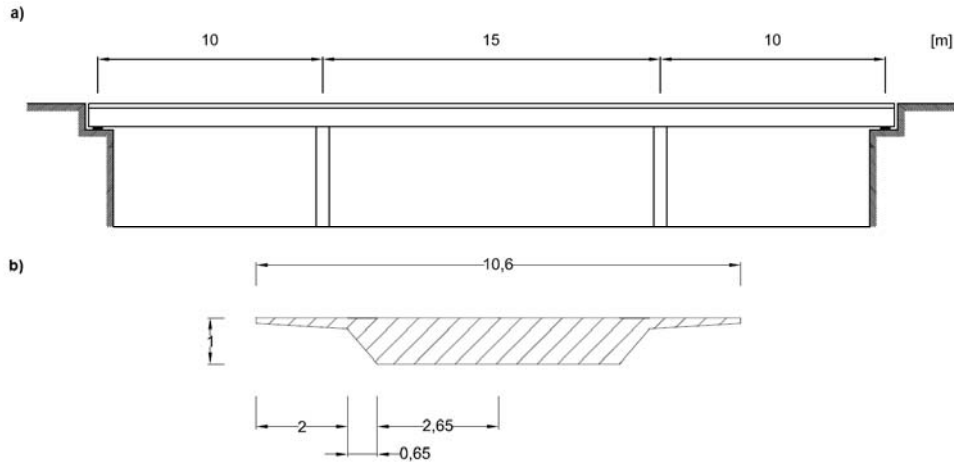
Scheme of bridge for stress amplitude calculation - a) elevation; b) cross-section (Dimensions in m)
